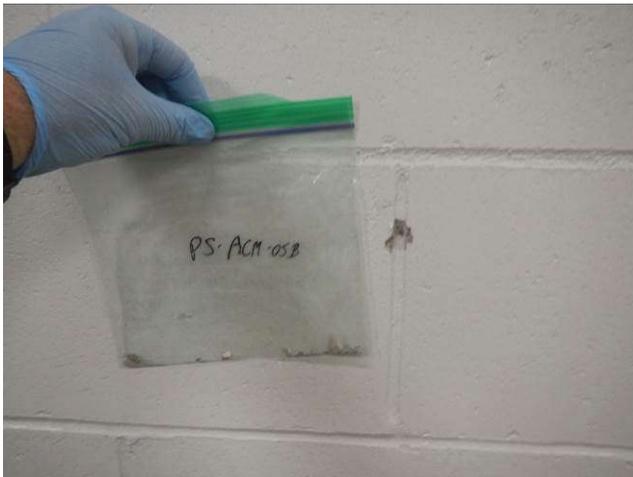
Sample location PS-ACM-05B, grey mortar, interior wall of "choline storage room" in Pumping Station Building.
